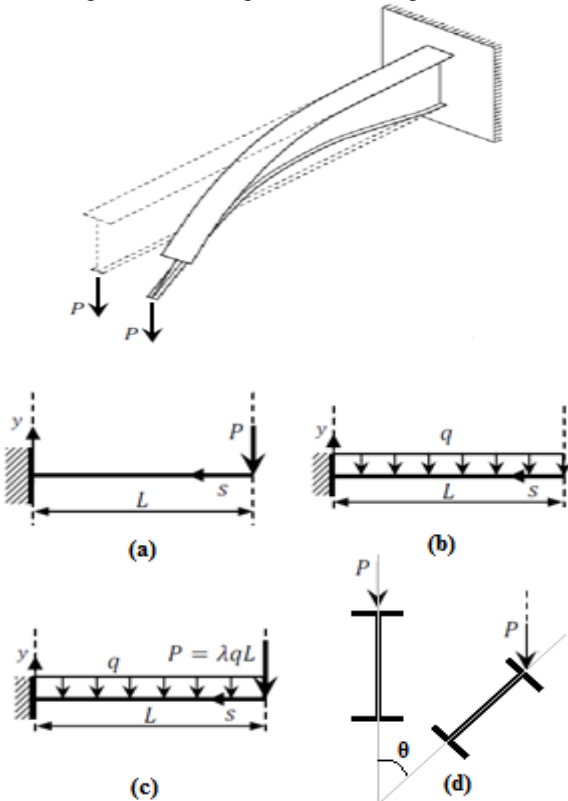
Bending & Lateral Torsional Buckling of I-section cantilever beam due to direct and or eccentric loading
